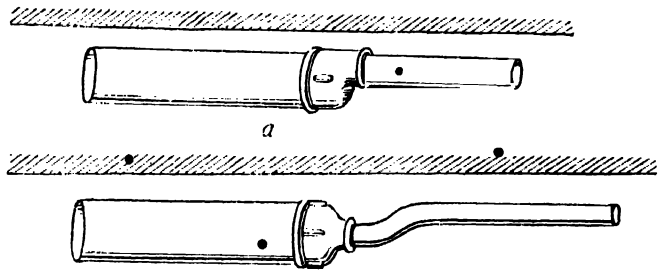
Reducing sockets on pipes : A, eccentric fitting used to maintain constant spacing from wall ; B, concentric fitting, requiring unsightly offset to maintain spacing.
